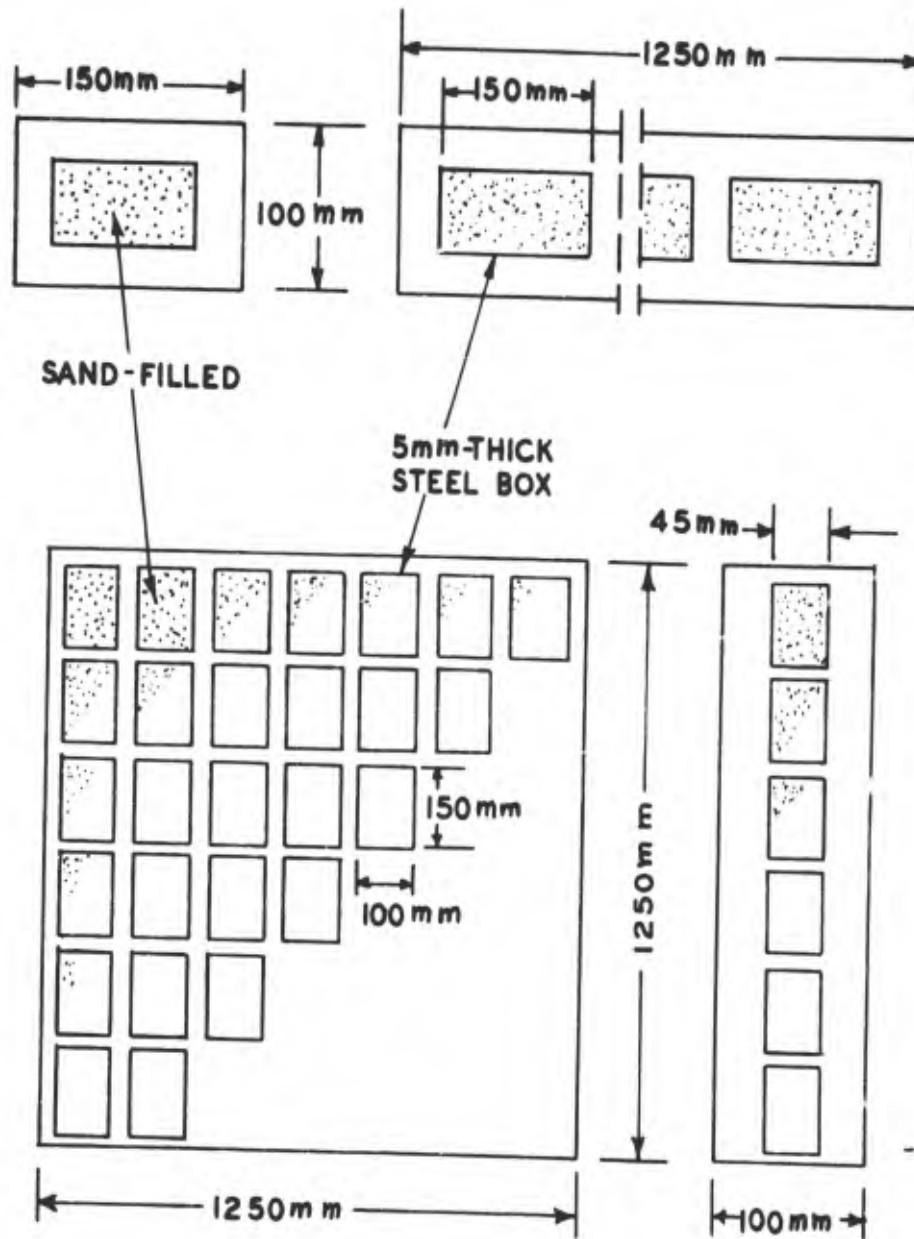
Concrete Test Bar and Panel; Sand-Filled
